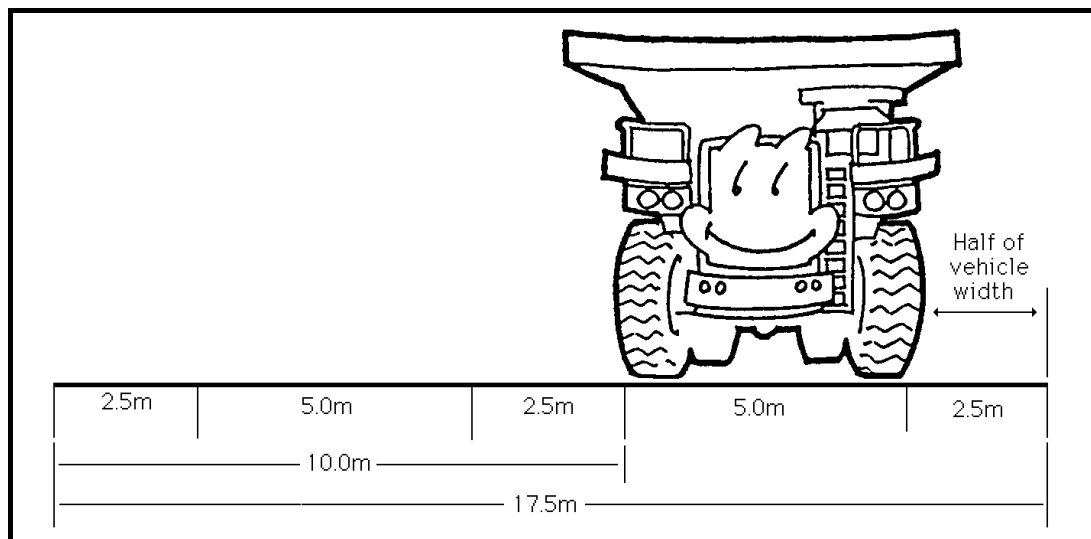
Haulroad width (two-way straight-section) for a 5 metre width haultruck
